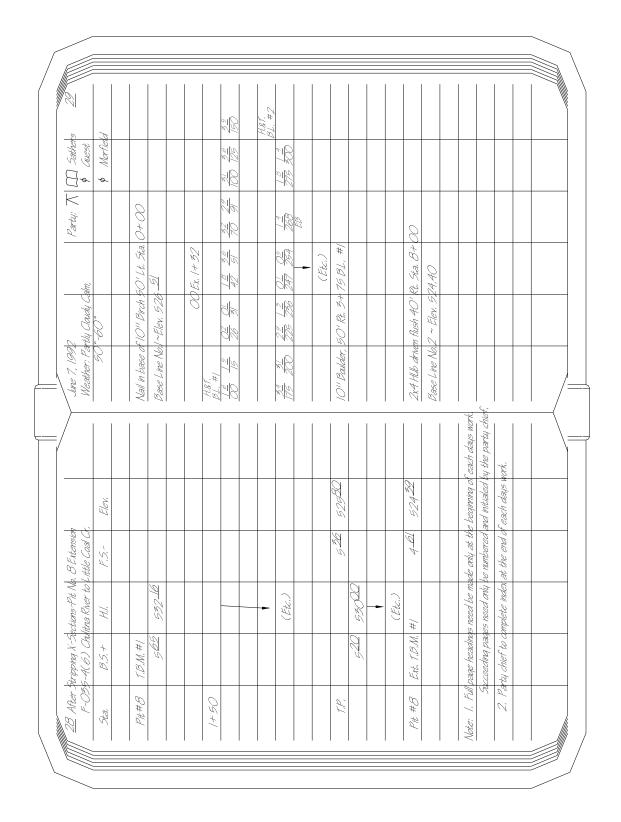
Sample Borrow Pit Cross Section Notes
